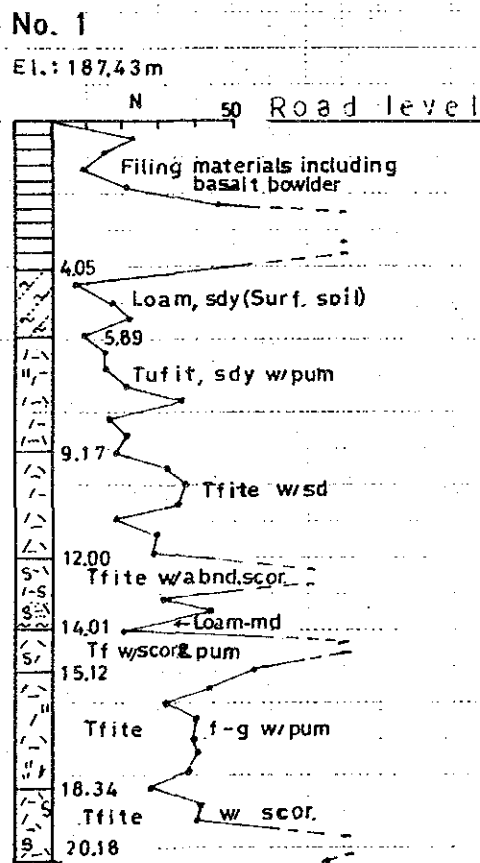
Soil Profile at the San Caralampio Bridge Site, Nandaime
